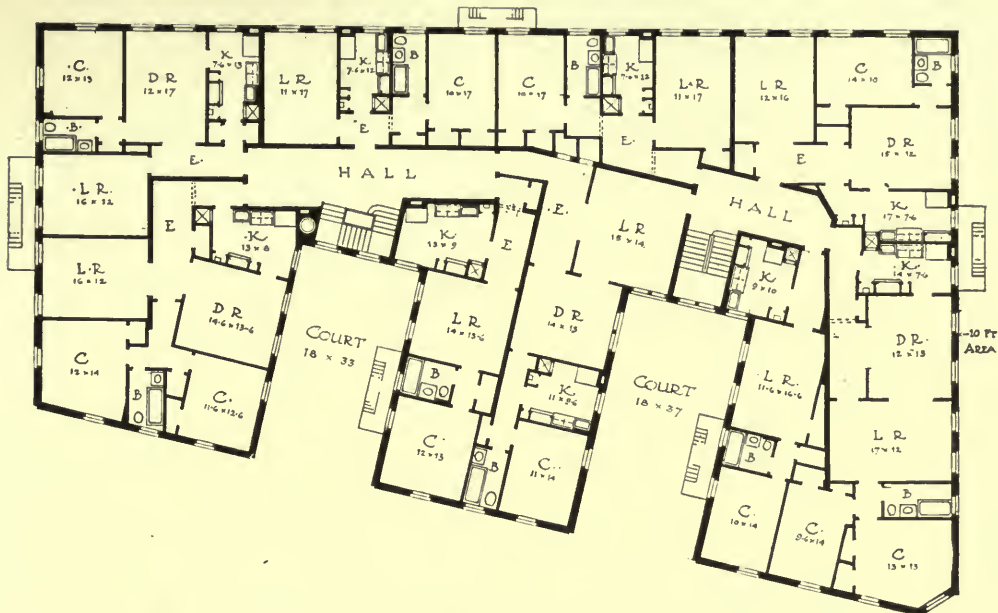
TYPICAL FLOOR PLAN—GOLD MEDAL APARTMENT HOUSE, CORNER OF GRAND CONCOURSE AND 167TH STREET, NEW YORK CITY.
